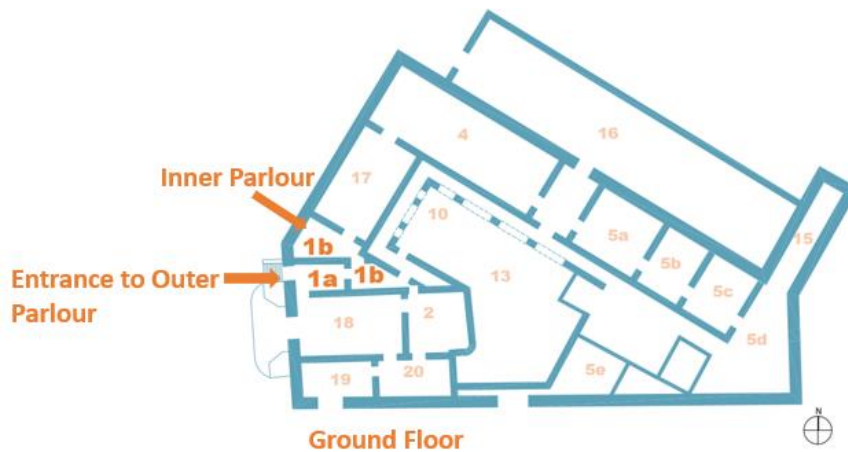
Inner parlour (Area 1b) and outer parlour (Area 1a) on ground floor plan
